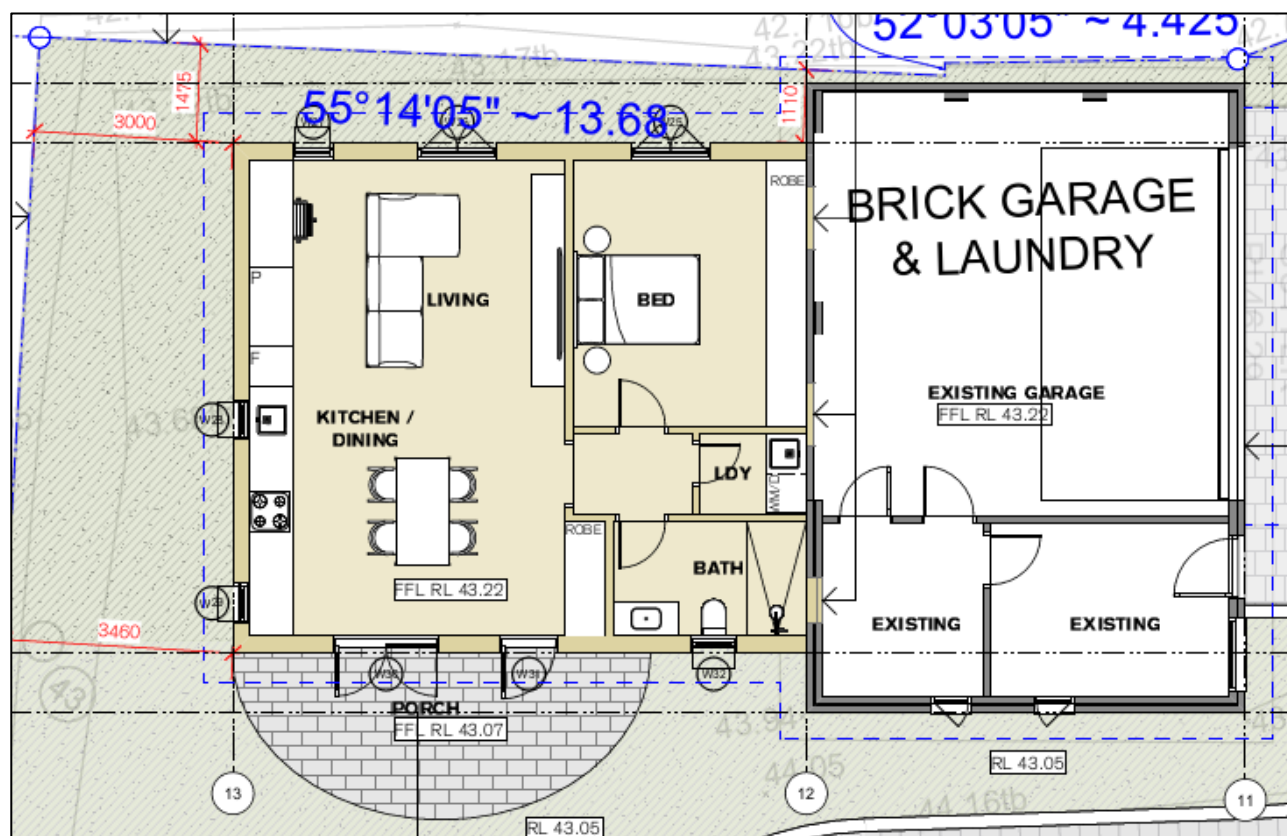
Extract of the applicant's submitted revised Secondary Dwelling Floor Plan.
